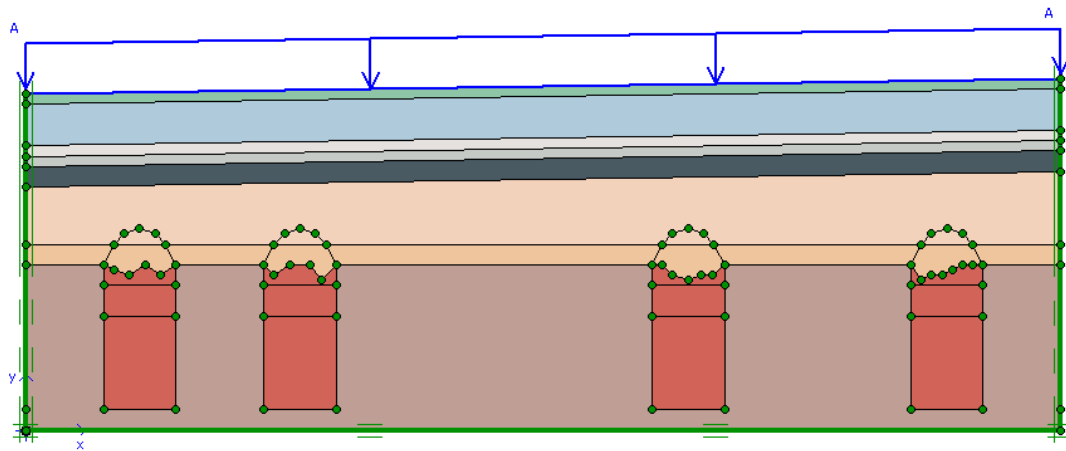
Model TrenchTrans2. 100-ft wide cross section across trenches 10, 8, 6, and 4 (moving left to right). Grading fill is 5.5-ft thick minimum. This configuration meets the acceptance criteria and no grouted columns are required at any trench.
